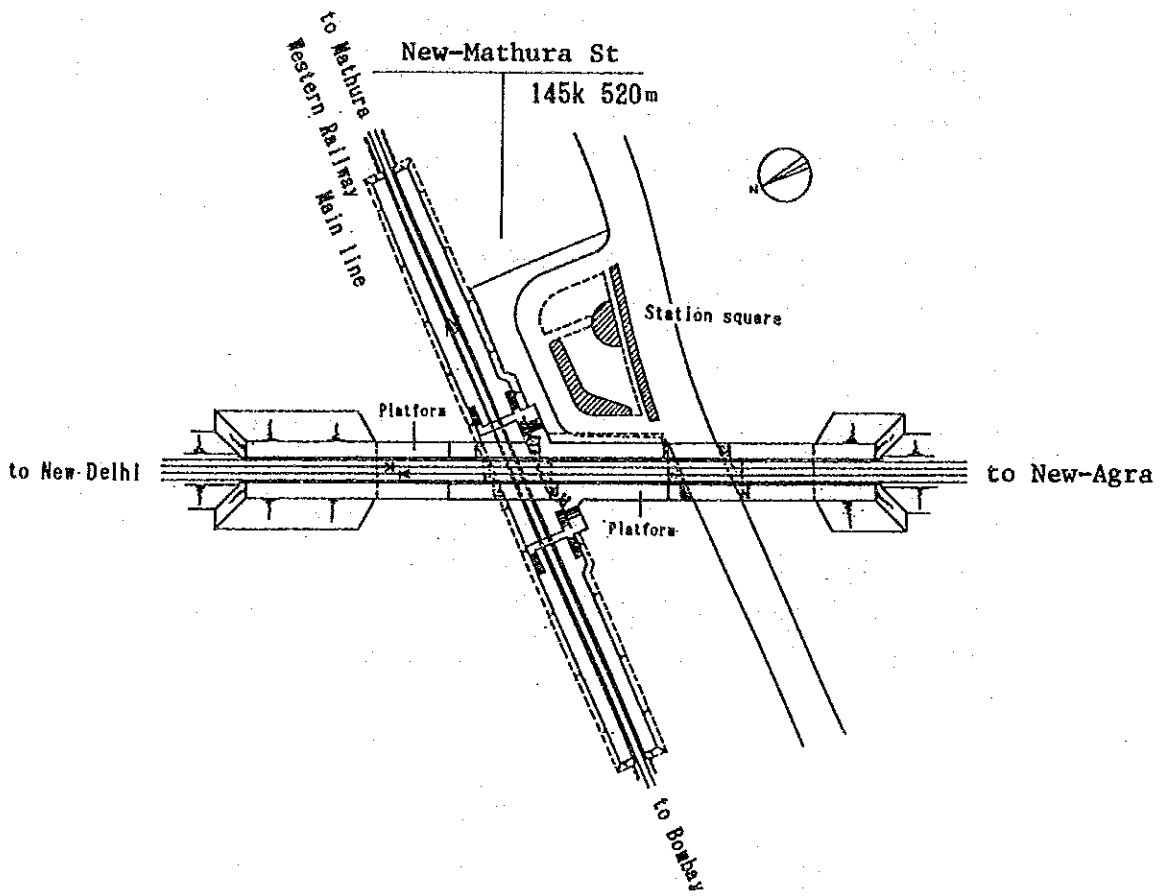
Plan of Intermediate Station (New-Mathura)
